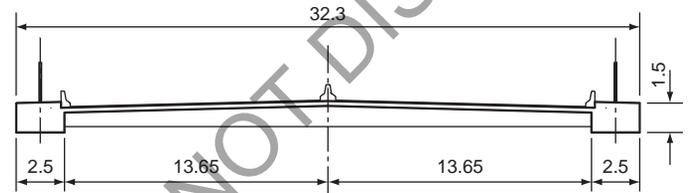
Twin beam concrete deck – Dames Point Bridge, USA (all dimensions in metres)
